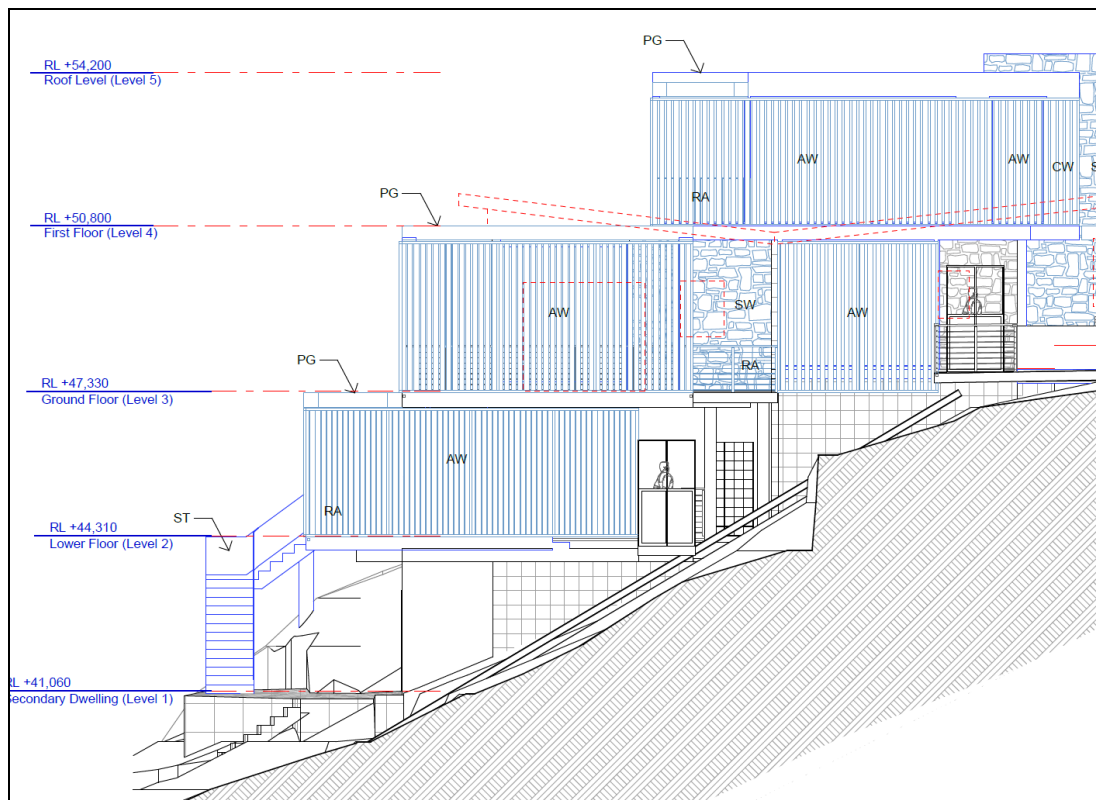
Showing north elevation (Northern Beaches Designs Sheet DA 13)
